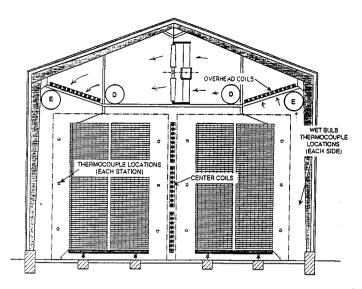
Typical double-track kiln cross section showing exhaust (E) and delivery (D) ducts for forced venting.
